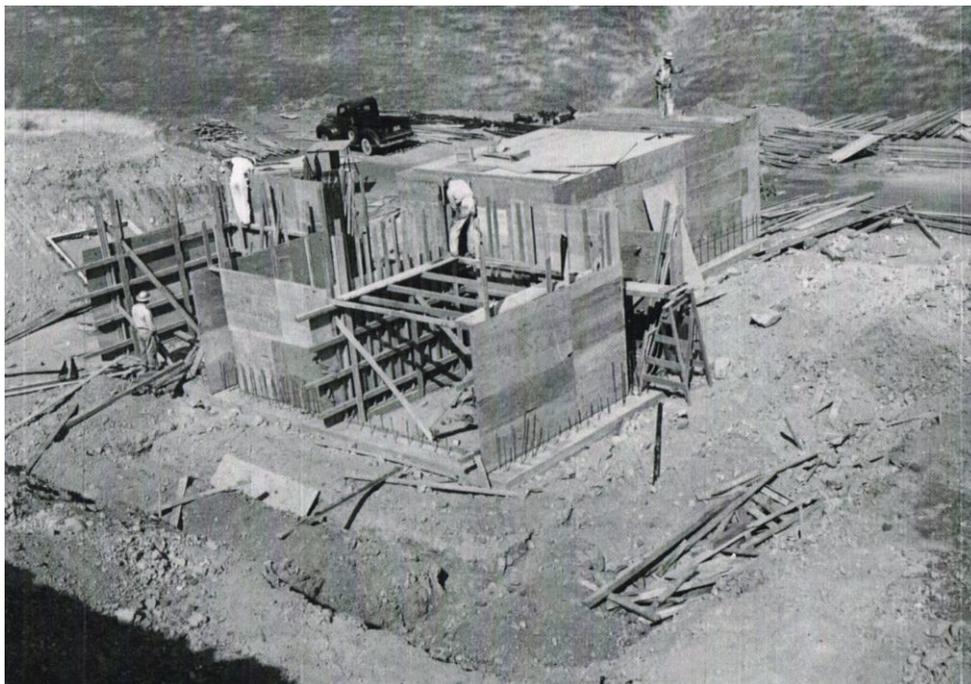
Hillside view of Building 825 under construction, looking northeast, ca. 1958.
